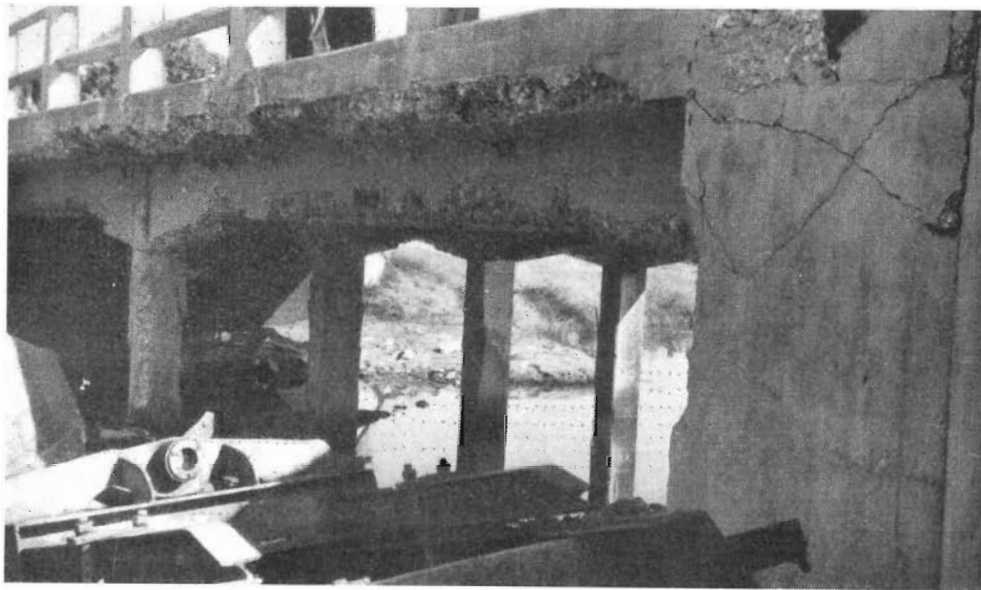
Fire damage to reinforced concrete bridge on the Hume Highway at Springhurst.
